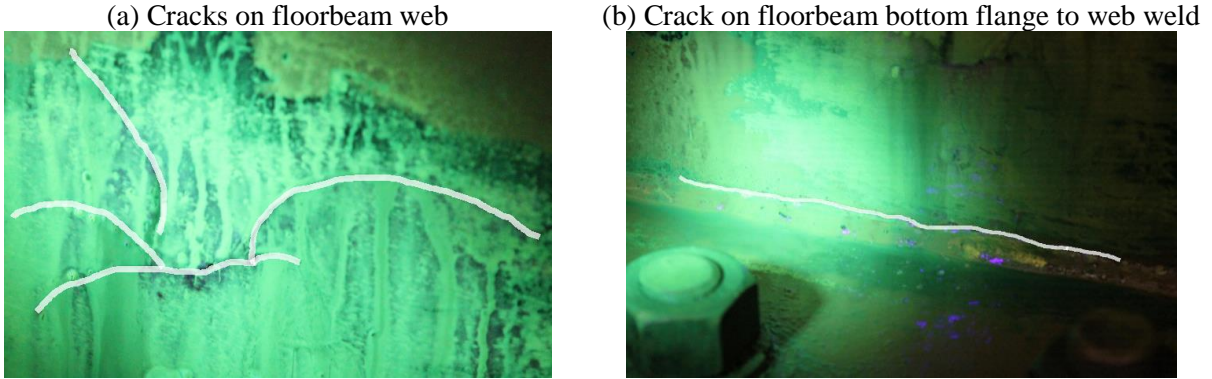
Cracks on floorbeam fascia side in Trial 8
